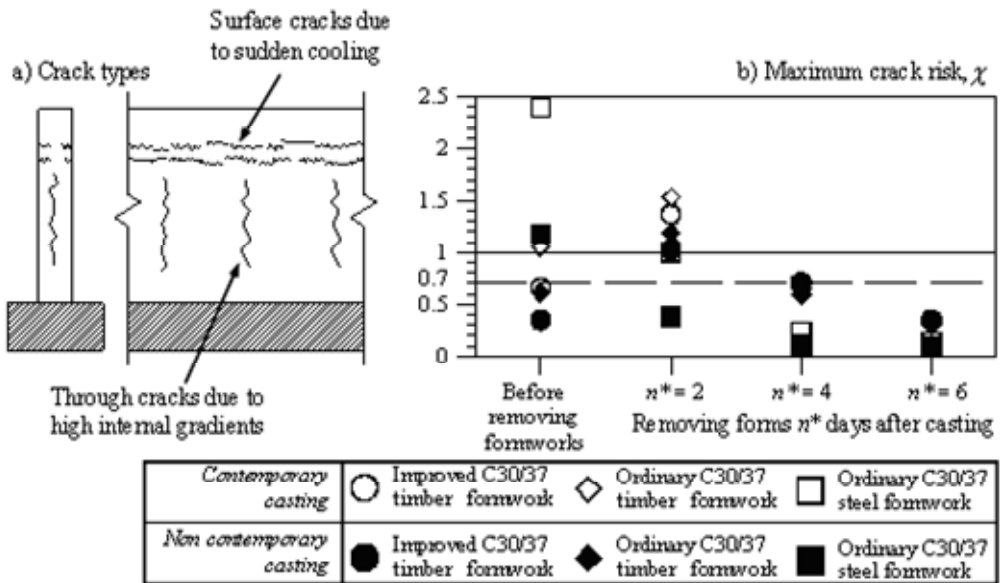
(a) Different types of cracks that may appear in the wall; and (b) maximum crack risk before and after the removal of the formworks, for contemporary and non-contemporary casting of the foundation slab and of the wall (Zanotti et al., 2010b).
